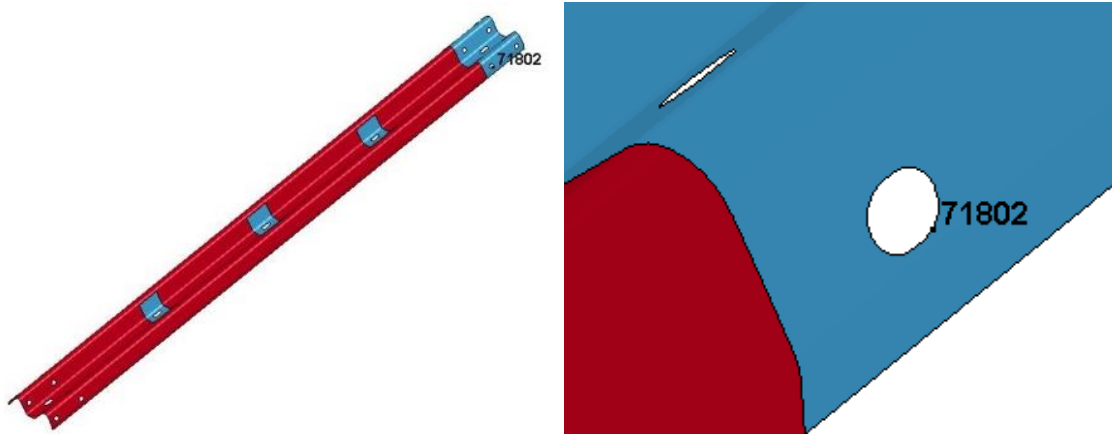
W-Beam Guardrail Model – Splice Failure
